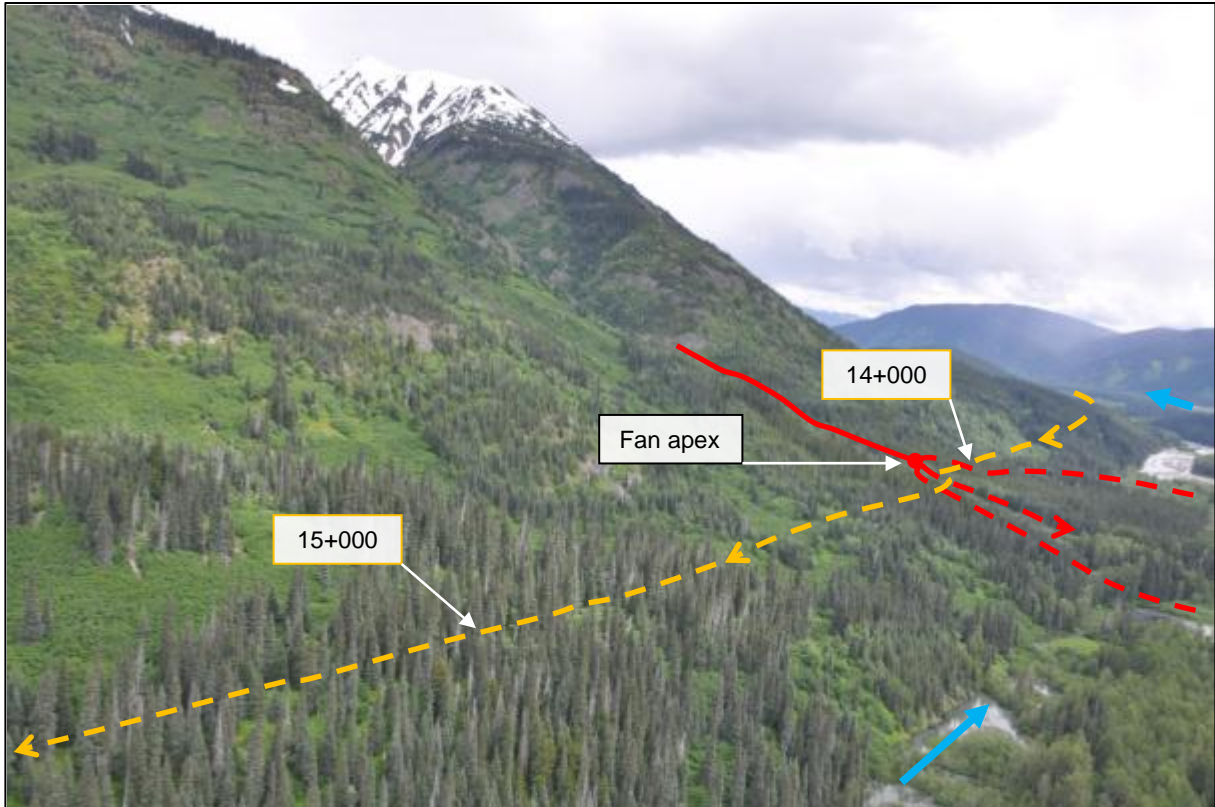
Treaty Creek Access Road – Looking upchain (southwest) from Highway 37 with the proposed Bell-Irving River bridge crossing in the foreground.
